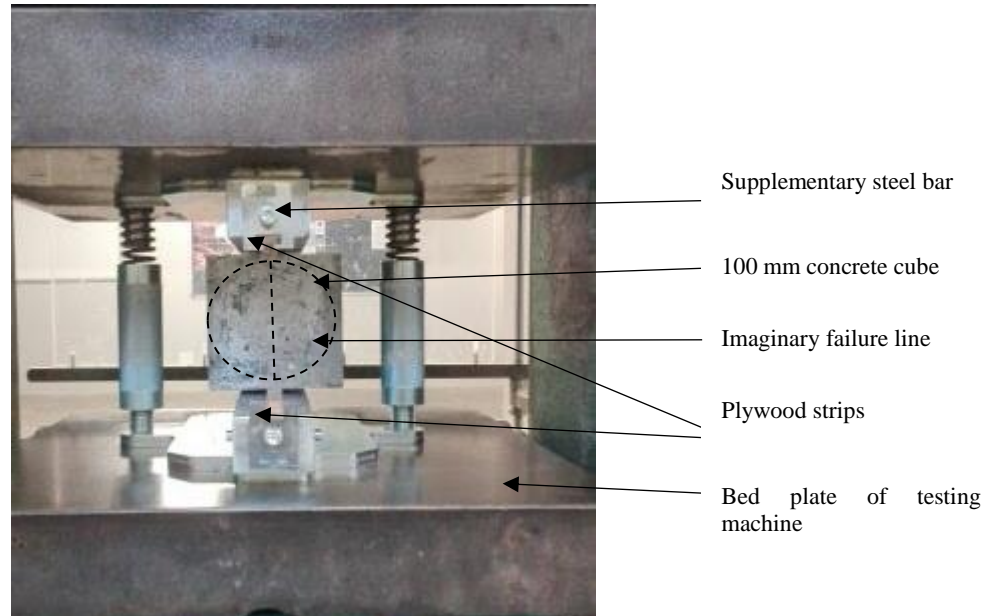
Tensile splitting strength test set up in a compressive test machine.
